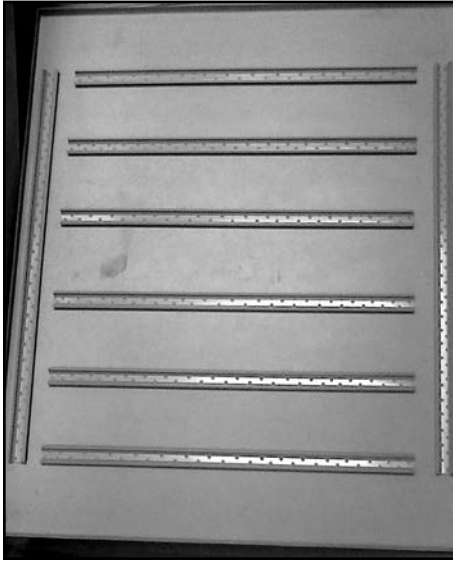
A - Dovetailed shaped ribs secure each panel when cast into the concrete structure.
